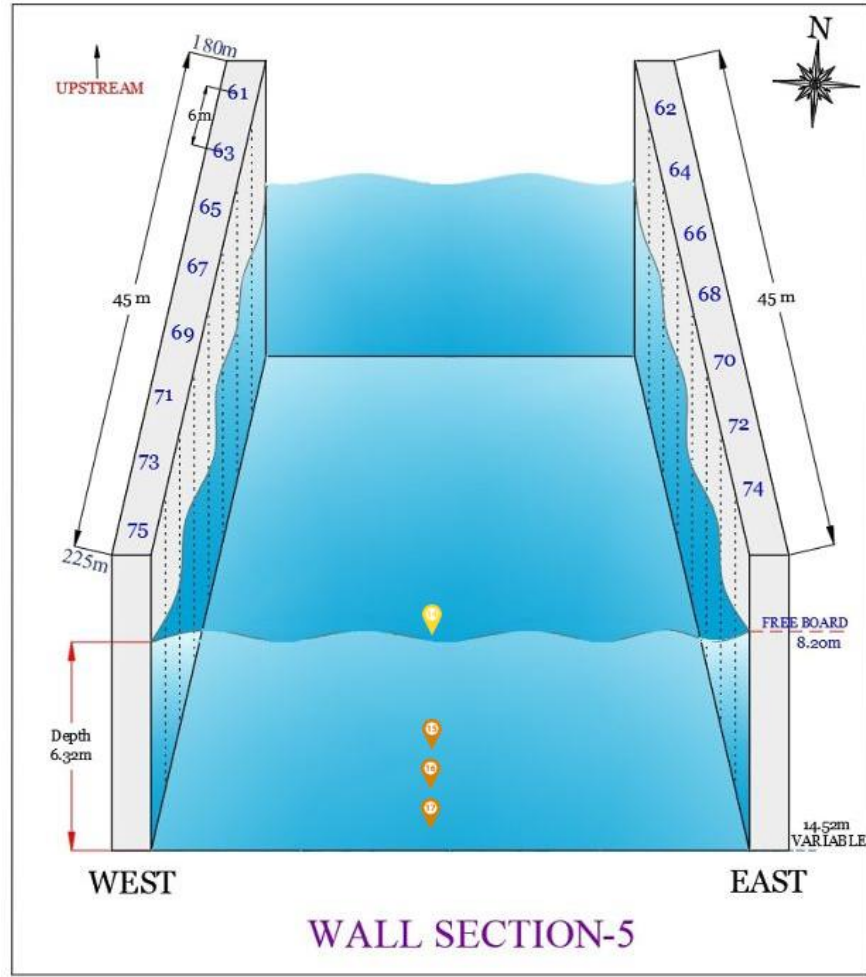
Heat map and Observations at Wall Bottom Section 61 - 75
